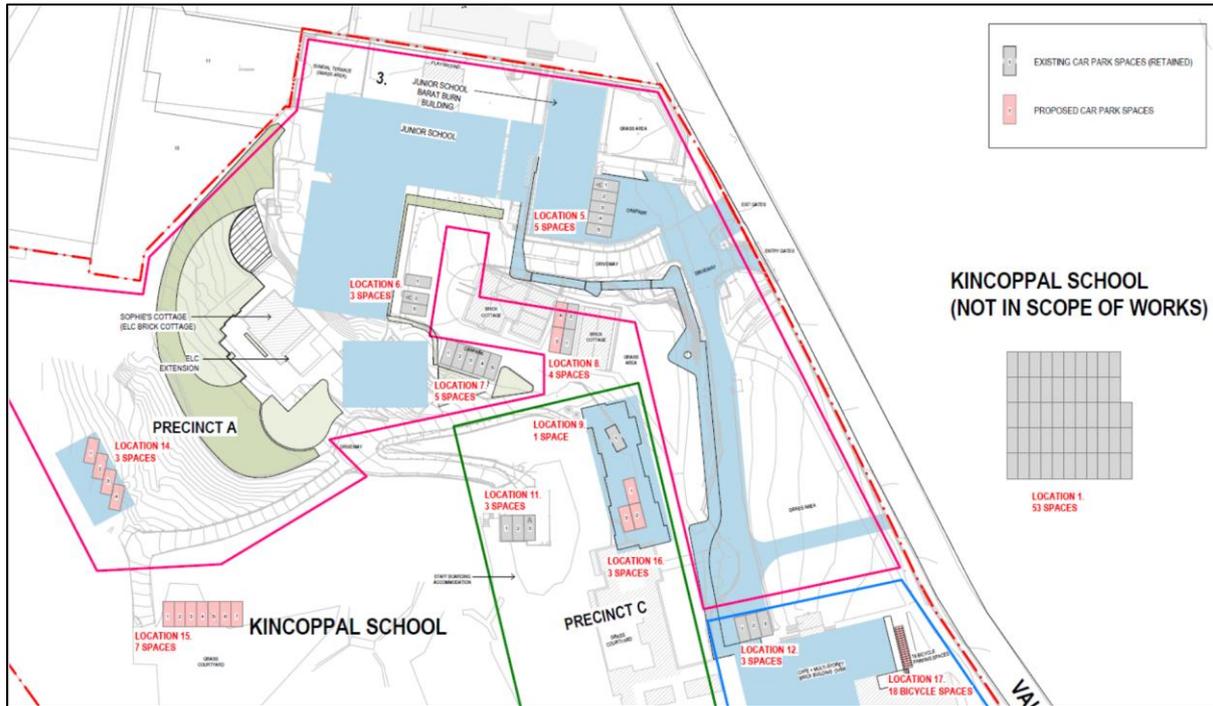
| Existing and proposed car parking precinct A and C (Source: Applicant's RtS)
